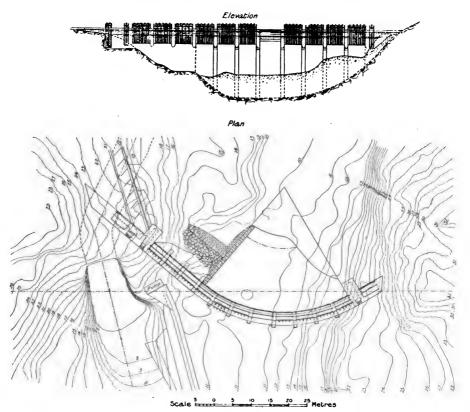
Section of River Bed, Elevation and Plan of Dam at Gullspång.
